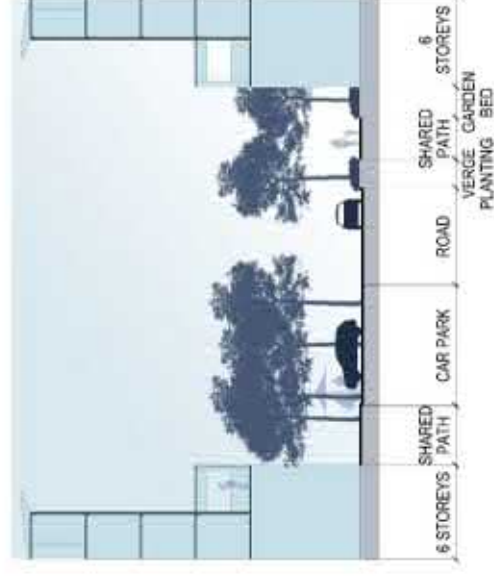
Daly Street (Plan Extract and Indicative Section)
